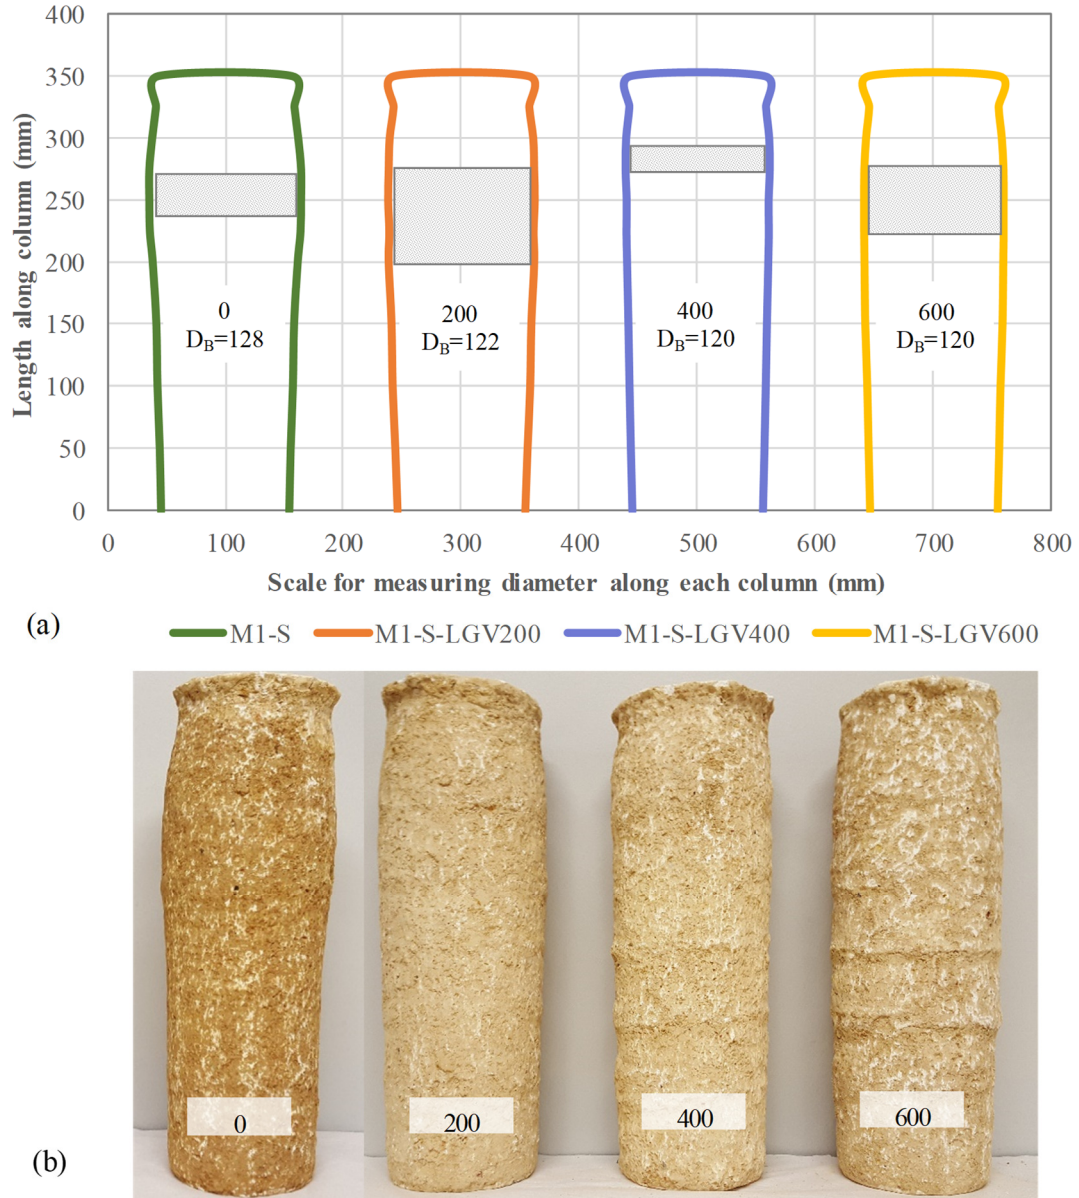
Deformations of tested columns reinforced with layers of Fibertex geotextile (GV), and installed in a base silt at OMC, (a) graphical plot and (b) pictorial illustration
